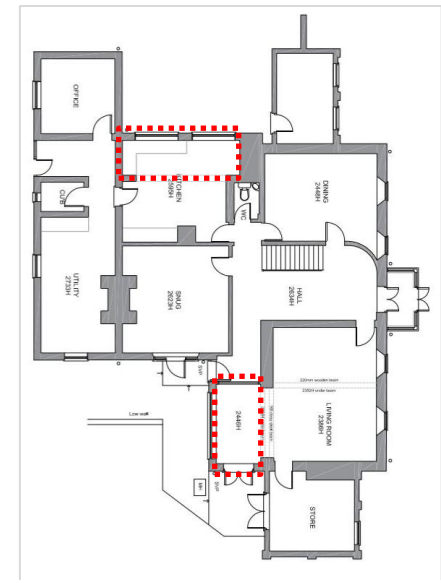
, current plan with addition to the north of the rear range, and an extension to the SW of the principal N-S range.
